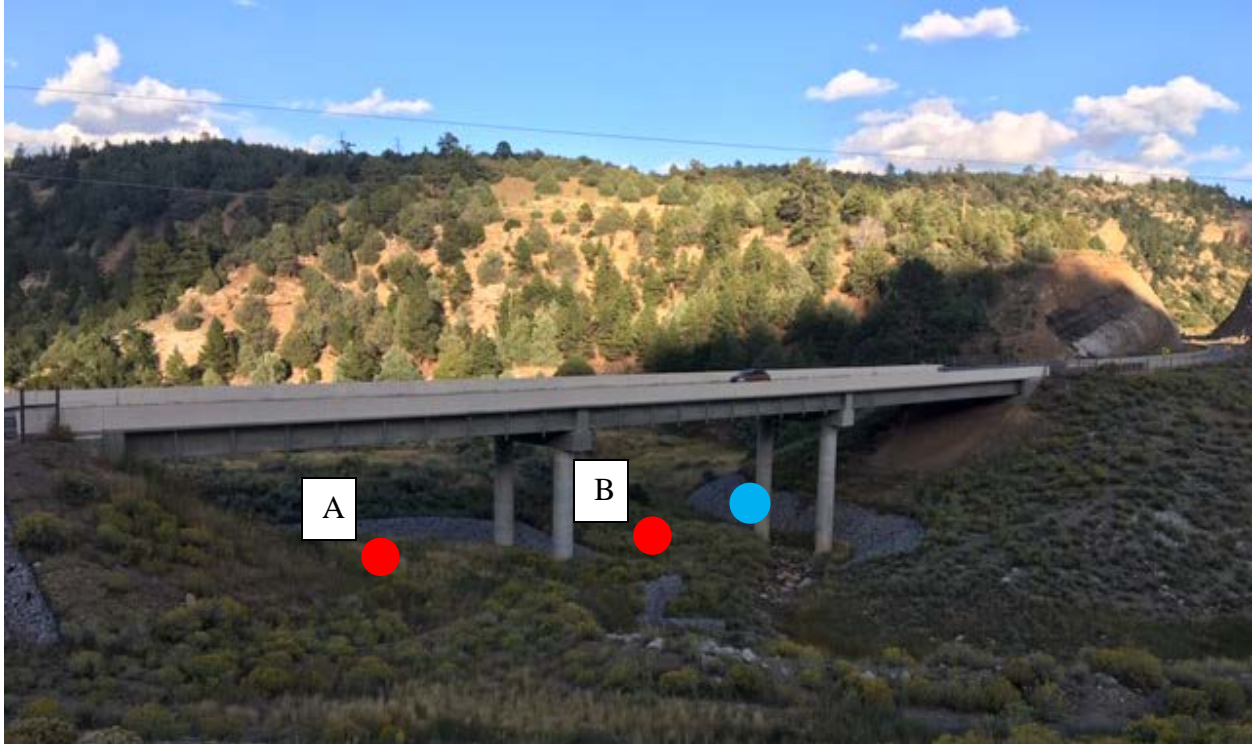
Pole installations (red circles) and pier installation (blue circle) at Bridge #9415, looking north.
